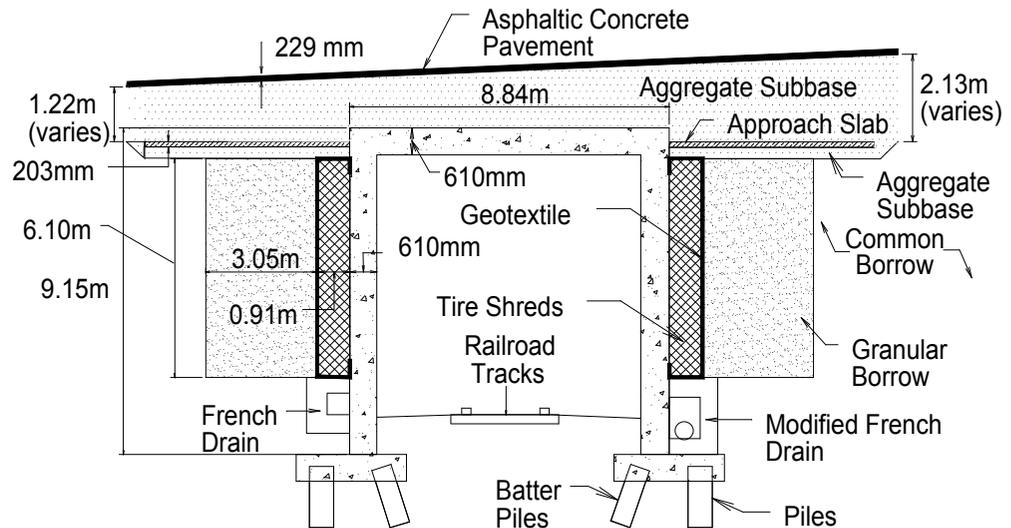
Tire shreds used as compressible backfill for rigid frame bridge on Topsham-Brunswick By-Pass project constructed in 1996 by the Maine DOT
